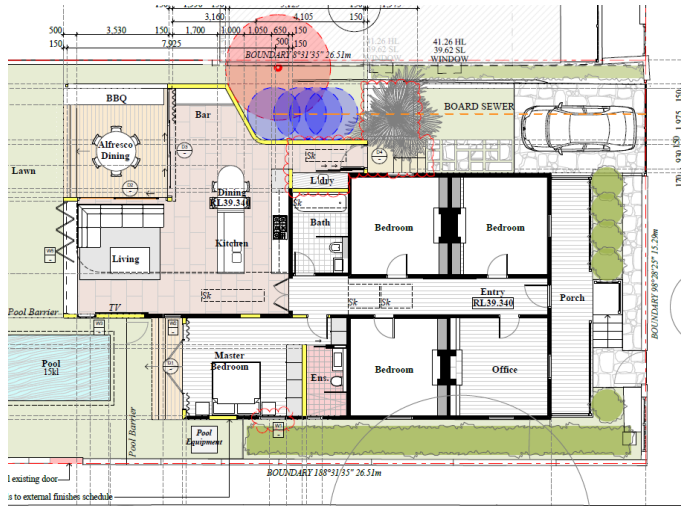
Approved building footprint (DA2023/0192 building footprint)
